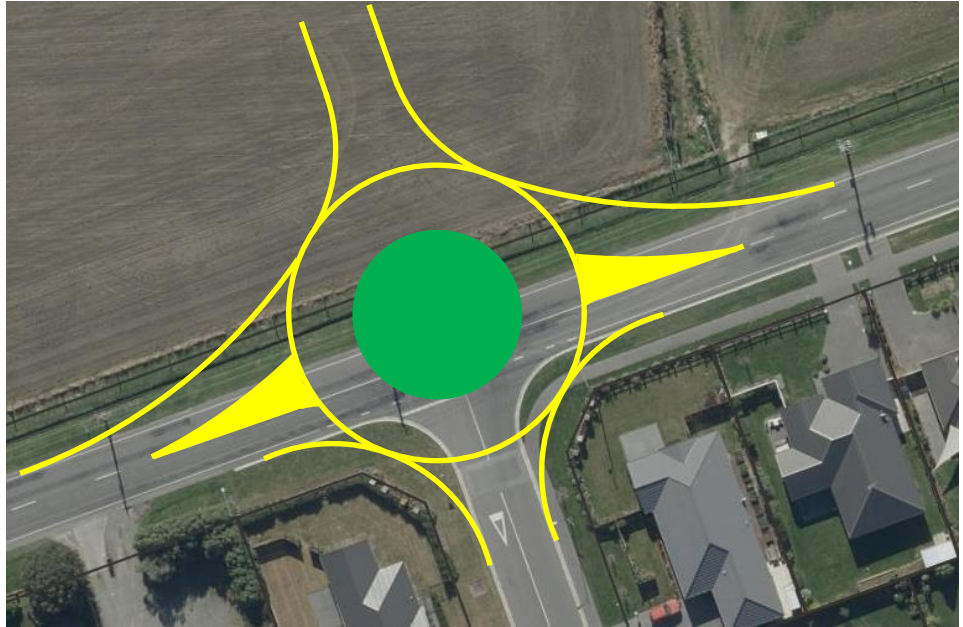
(Highly) Indicative Roundabout at High Street / Clausen Avenue / Site Access Intersection
